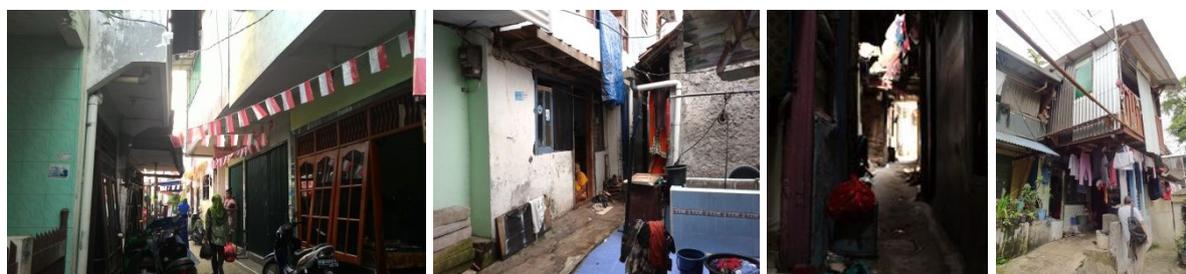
The Various of UBSR implementation of Cantilever Structure
